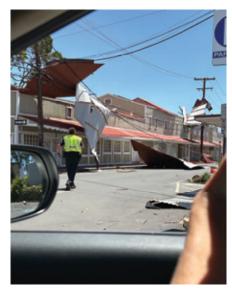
August 8, 2023, at 13:46. Civilian photo of roof damage, looking west down Lahainaluna Road from Luakini Street.
